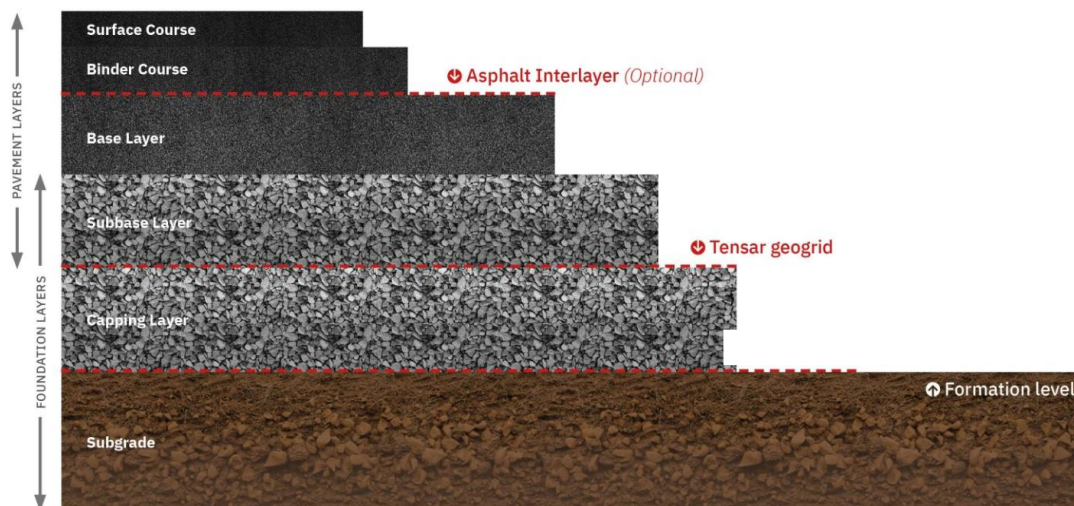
Layers of flexible pavement (Source: Introduction to pavement design, Civil IITB)
